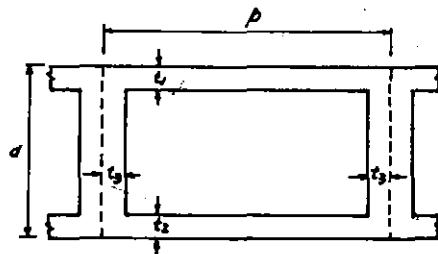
Nomenclature for torsional stiffness calculations of box section bridge beams
